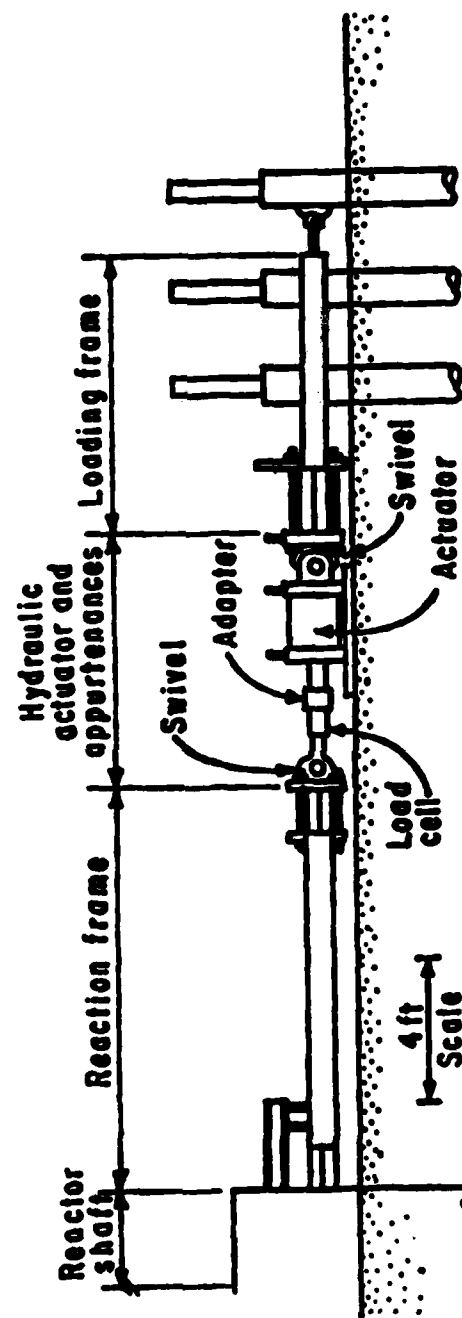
Schematic drawing of the loading system for the pile group.
